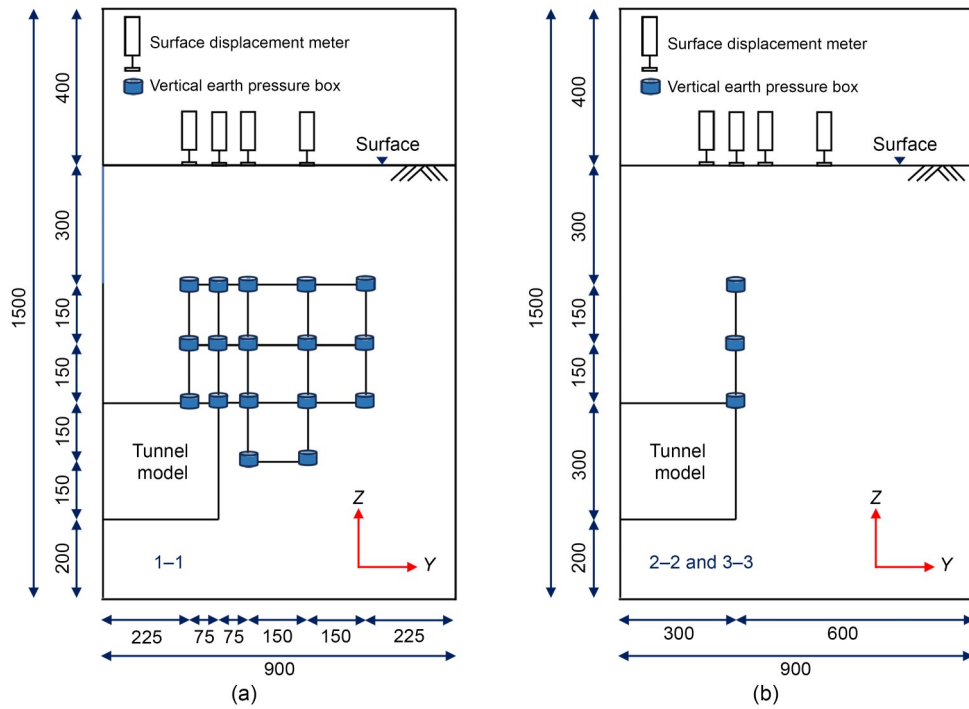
Distribution of earth pressure boxes in the strata: (a) 1-1 section; (b) 2-2 and 3-3 sections (unit: mm)
